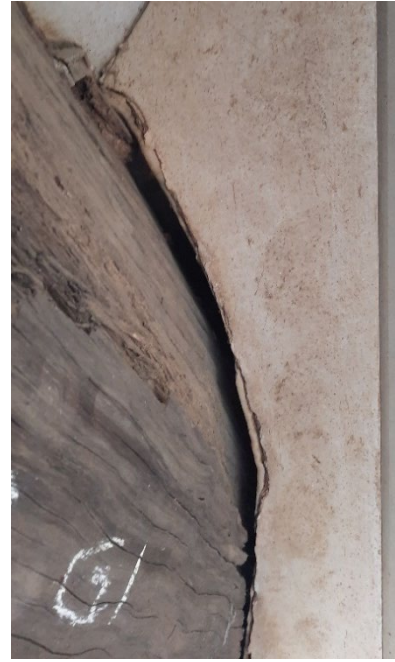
View of a gap next to a wooden girder underneath Spring Creek bridge
